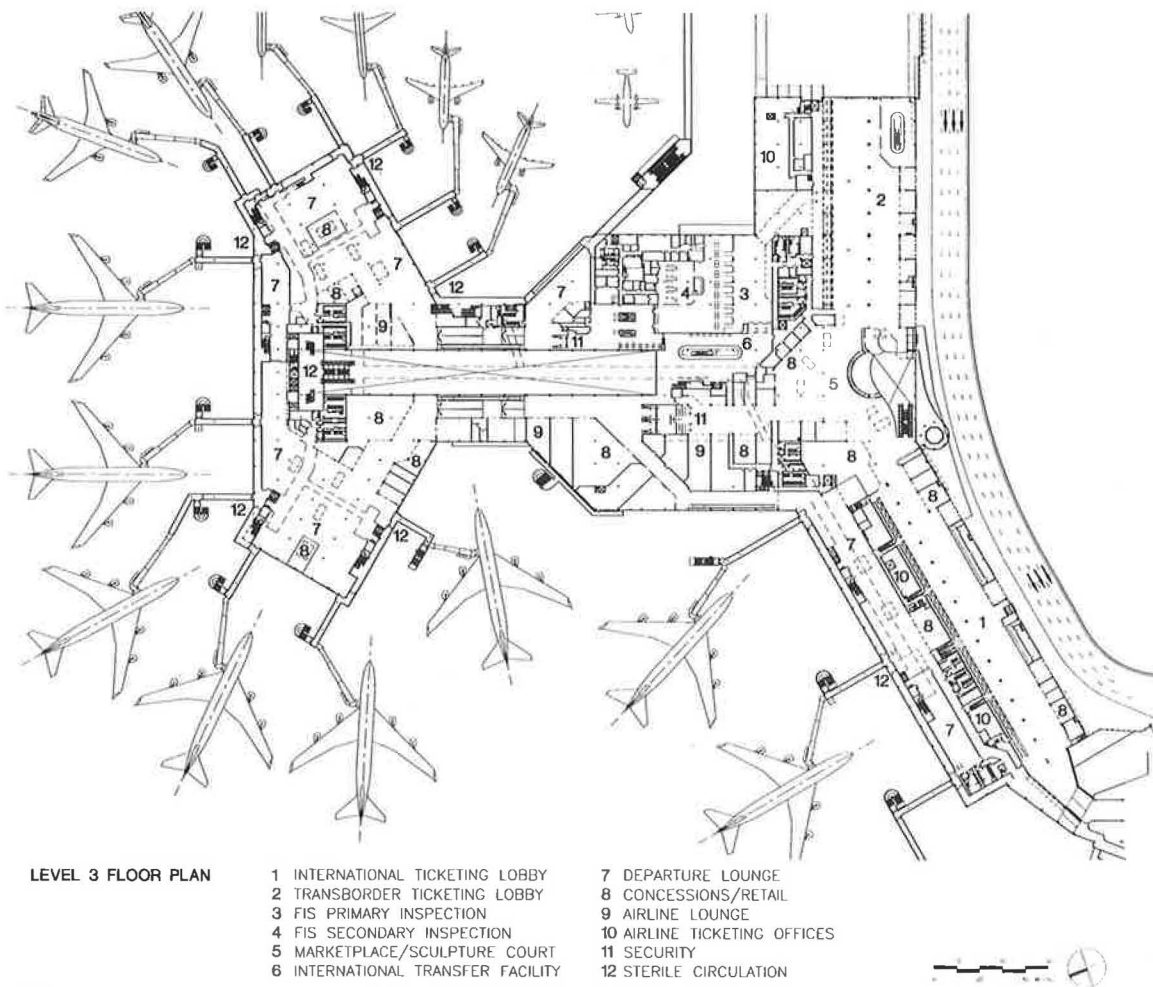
Vancouver International Terminal, level 3 floor plan.
